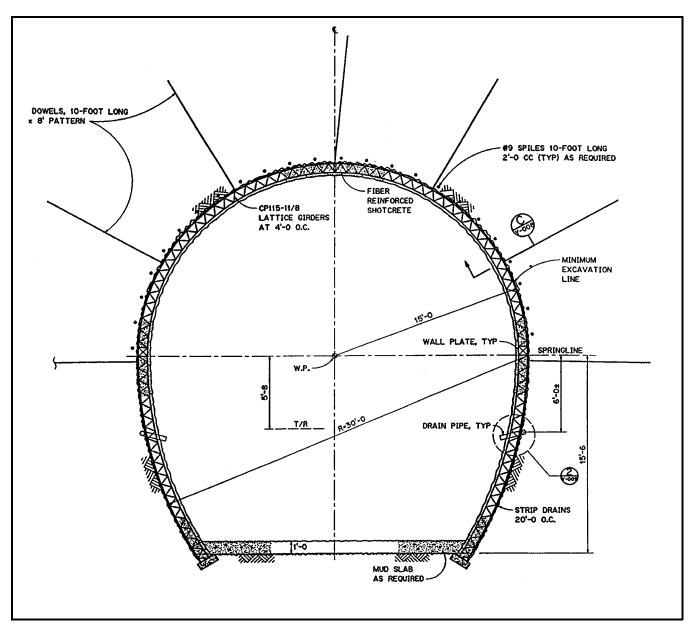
Lattice girders used as final support with steel-reinforced shotcrete, dowels, and spiles
